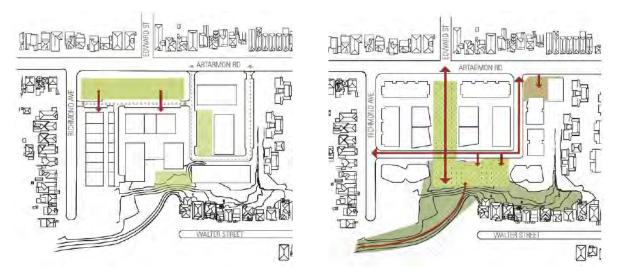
Comparison of the approved and proposed masterplan—approved concept plan (left) and proposed master plan (right). (Source: CHROFI Master Plan 2016)
